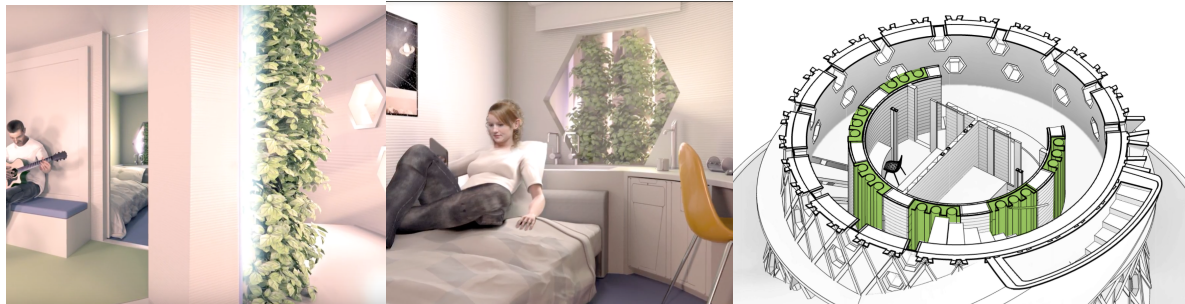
Vertically oriented hydroponic greenhouse embedded within MEP walls along central staircase.
